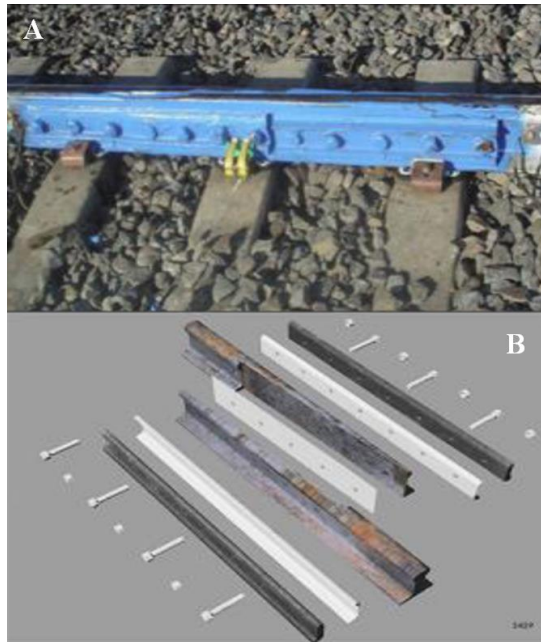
(A) Lap joint detail design components, (B) mitre-cut/long-angle cut insulated rail joint
